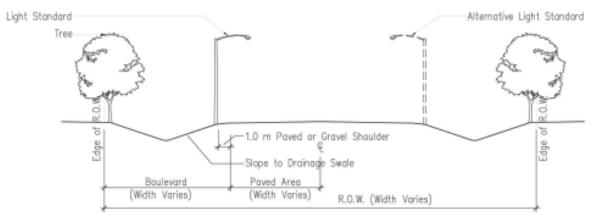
i - Existing Arterial Prototype (Rural Road Section)
